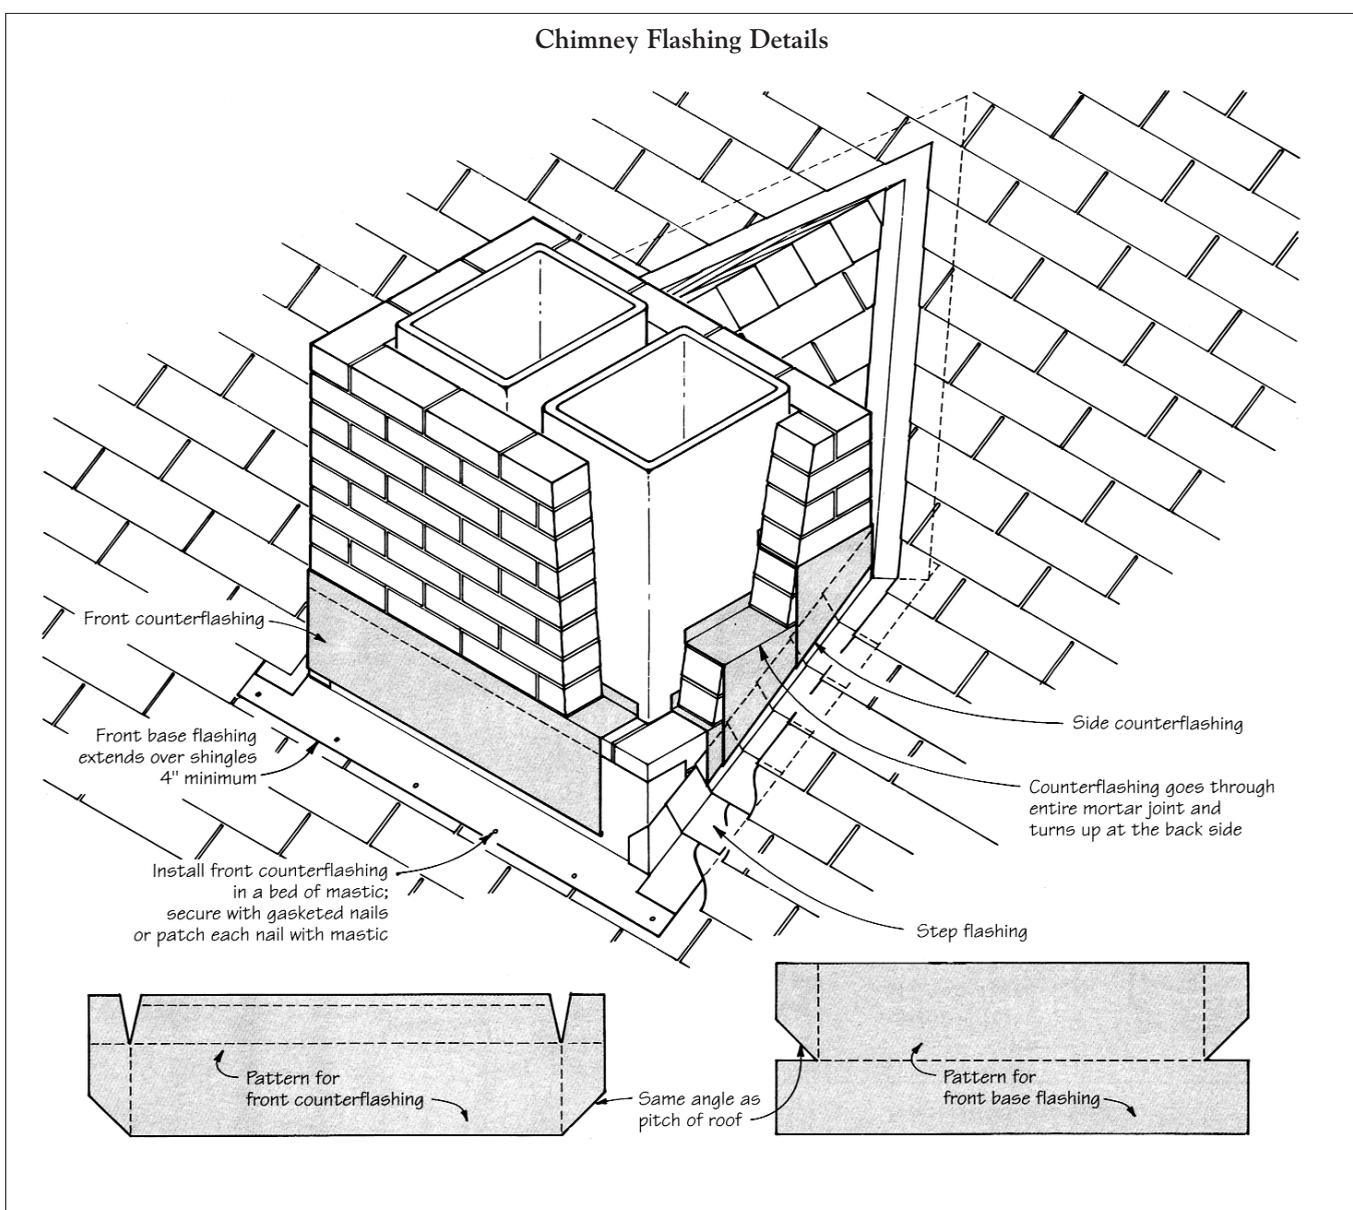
When flashing a chimney, never attach a flashing to both the chimney and the roof. The base flashings are attached to the roof only, the counterflashings to the chimney only. This creates a slip membrane, allowing the house to move independently of the chimney.
